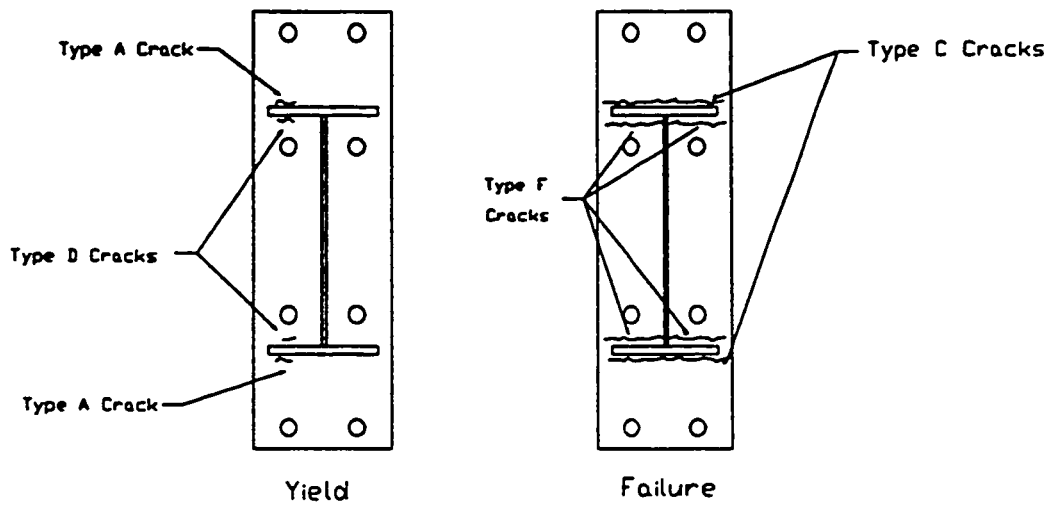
Crack Locations at Yield and Failure for Connection B-3
